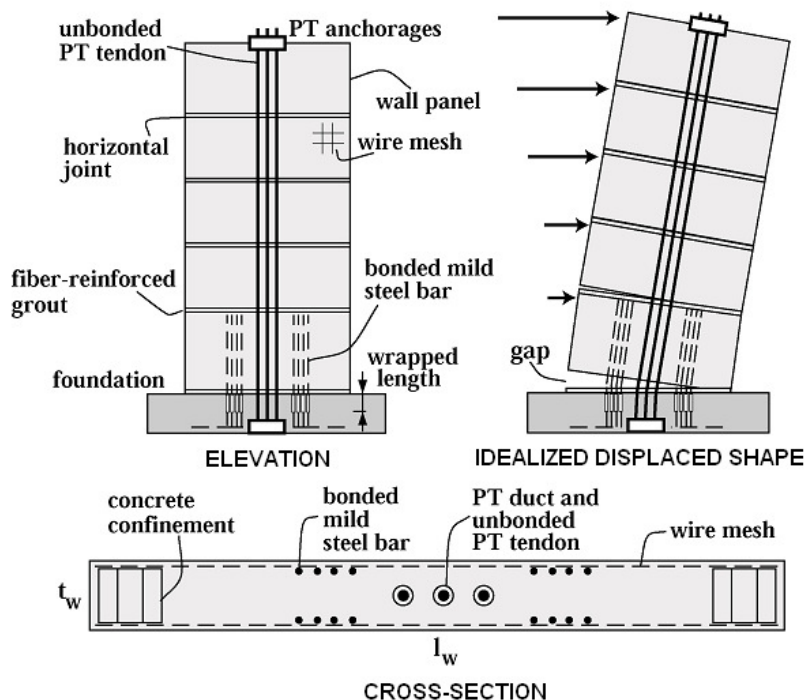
Schematic of typical hybrid wall system (Smith and Kurama, 2009)
